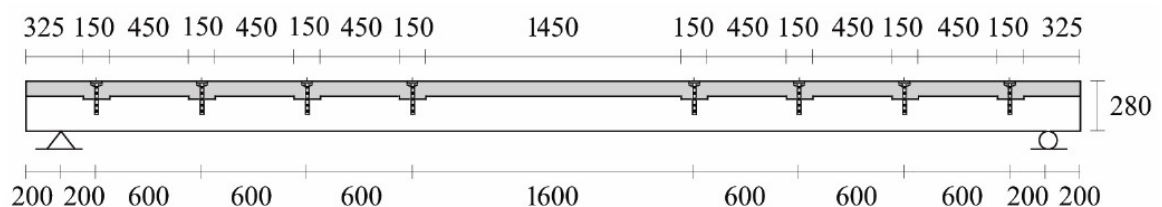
Longitudinal-section of the timber-concrete composite beam with grooved connections and glued steel dowels used for bending tests
